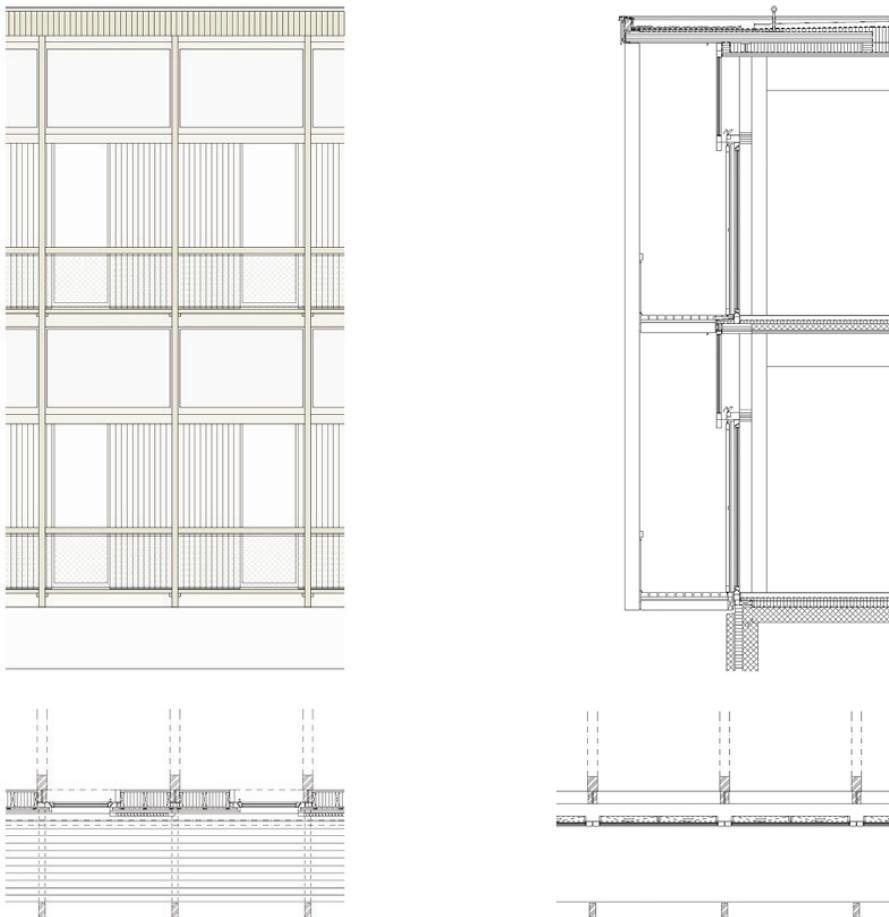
| Construction details of the exterior balcony plants, elevation and section (source: detail.de, 2023).
